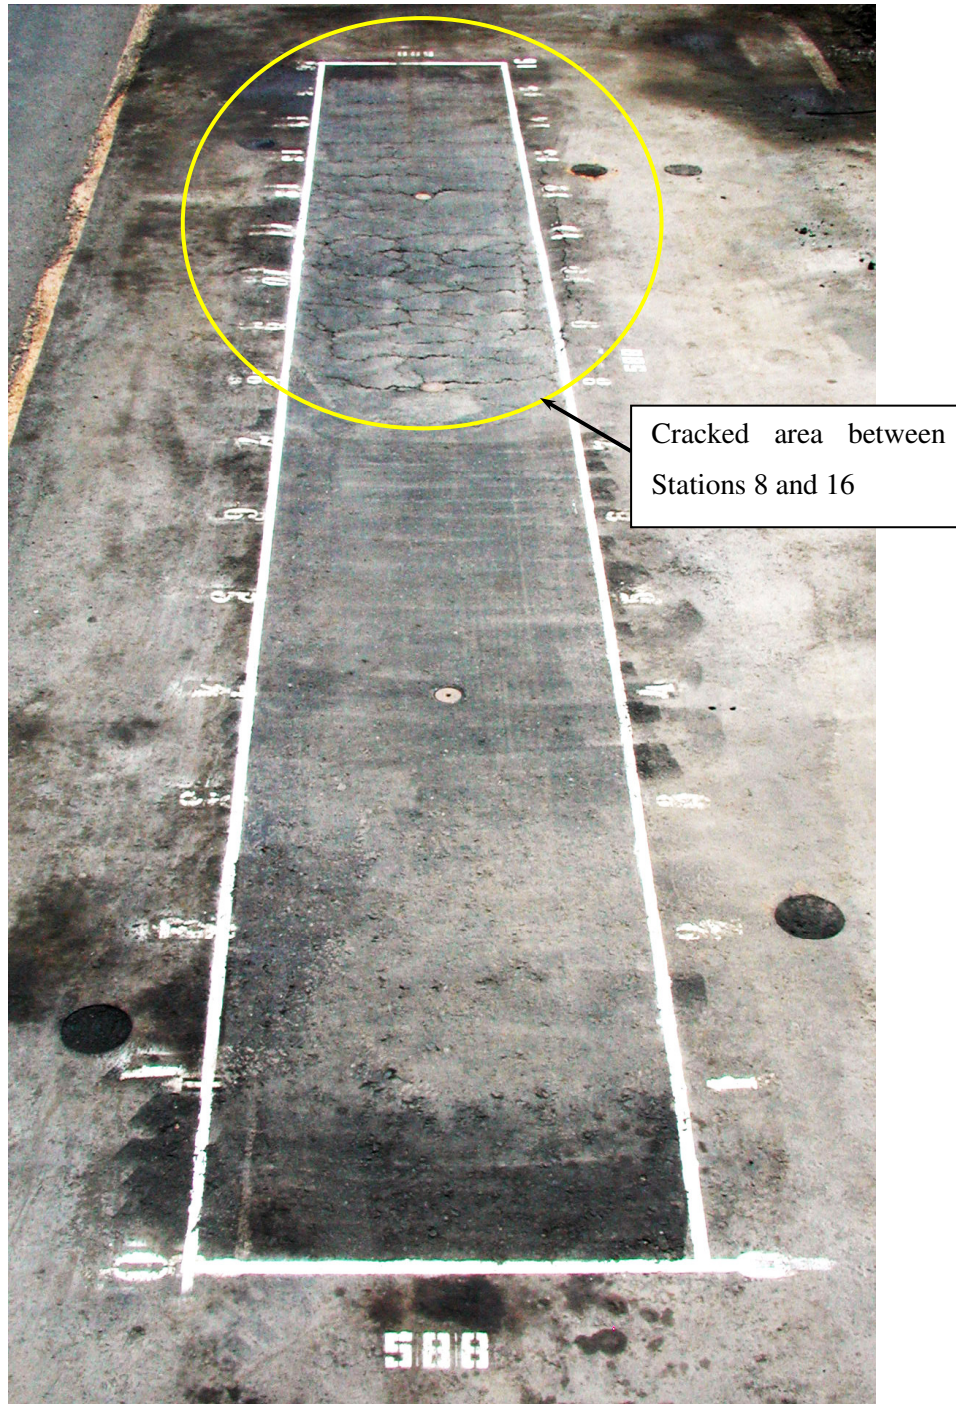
Photograph of Section 588RF showing cracks in one half of the section.
